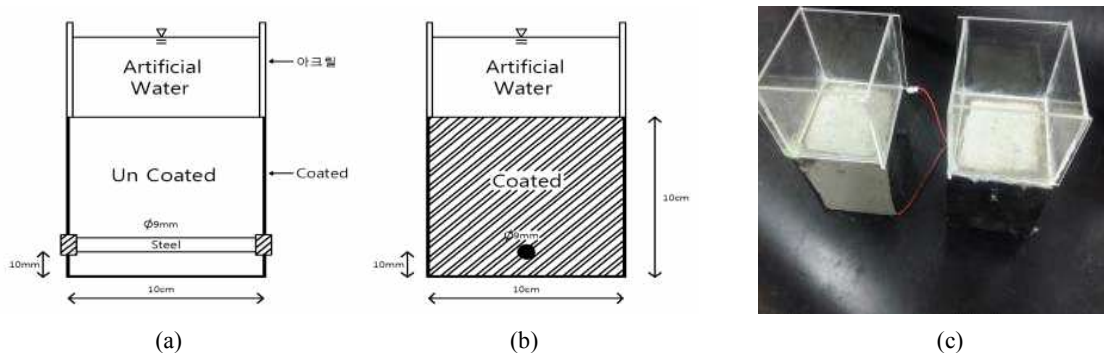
Specimens with ponding well for dry and wet conditions (a) Front view, (b) Side view, (c) specimens picture.
